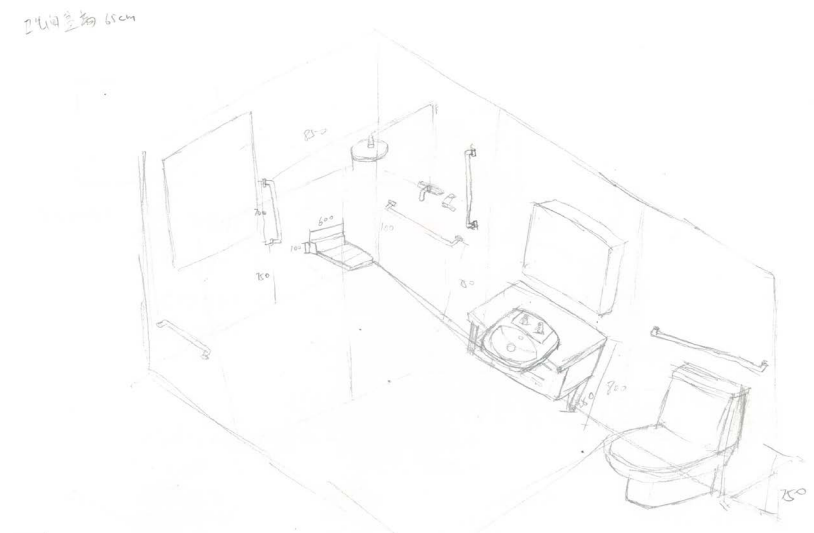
Draft Drawing for Bathroom Setting*, hand drawing by Qiyu Zuo, 2020.
